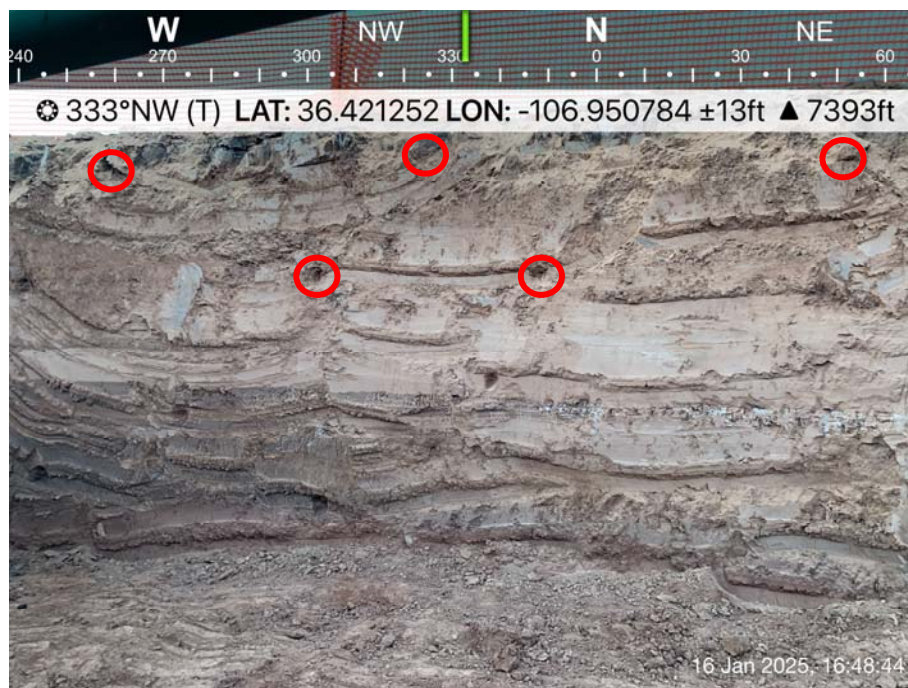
SS11 collected as a five-point composite sample 0-4 ft bgs from northwest sidewall of excavation.
